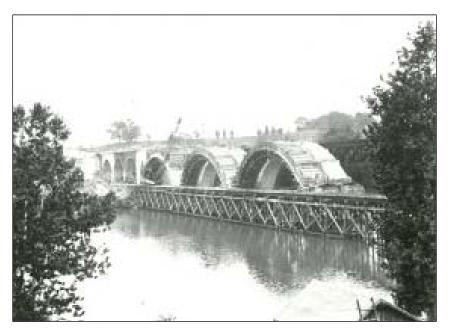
PHOTOGRAPH OF THE RAPPAHANNOCK RIVER RAILROAD BRIDGE UNDER CONSTRUCTION IN 1926 (BLACKWELL 2016)
